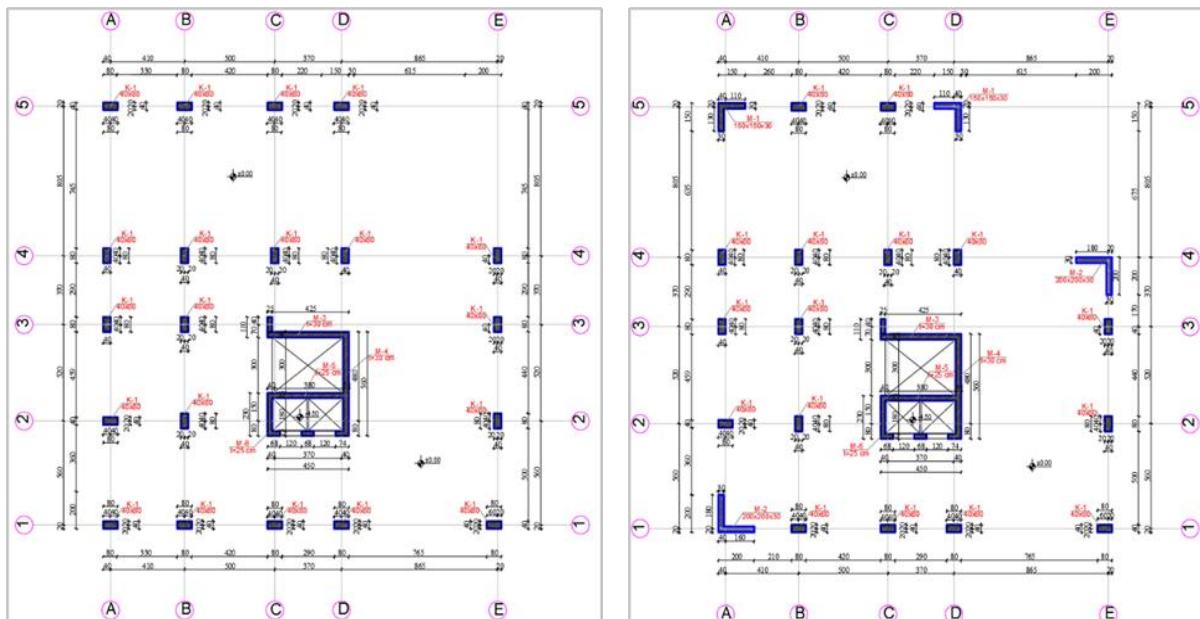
a) Building plan with columns. b) Building plan with shear walls. Source (Authors, 2024)
